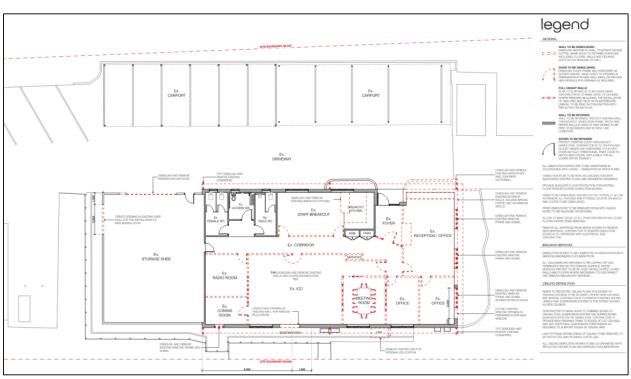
Proposed Ground Floor Demolition Plan (Source: Lead Architects 2024)
